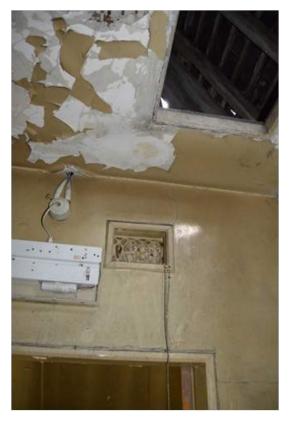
Vents above the doors to the rooms of the second floor accommodation.
